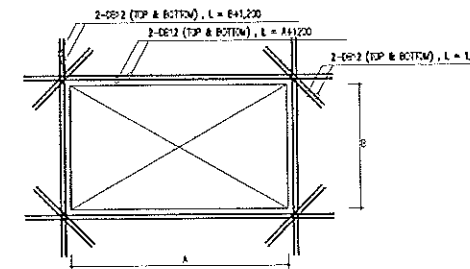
REINFORCEMENT AT SLAB CORNER
